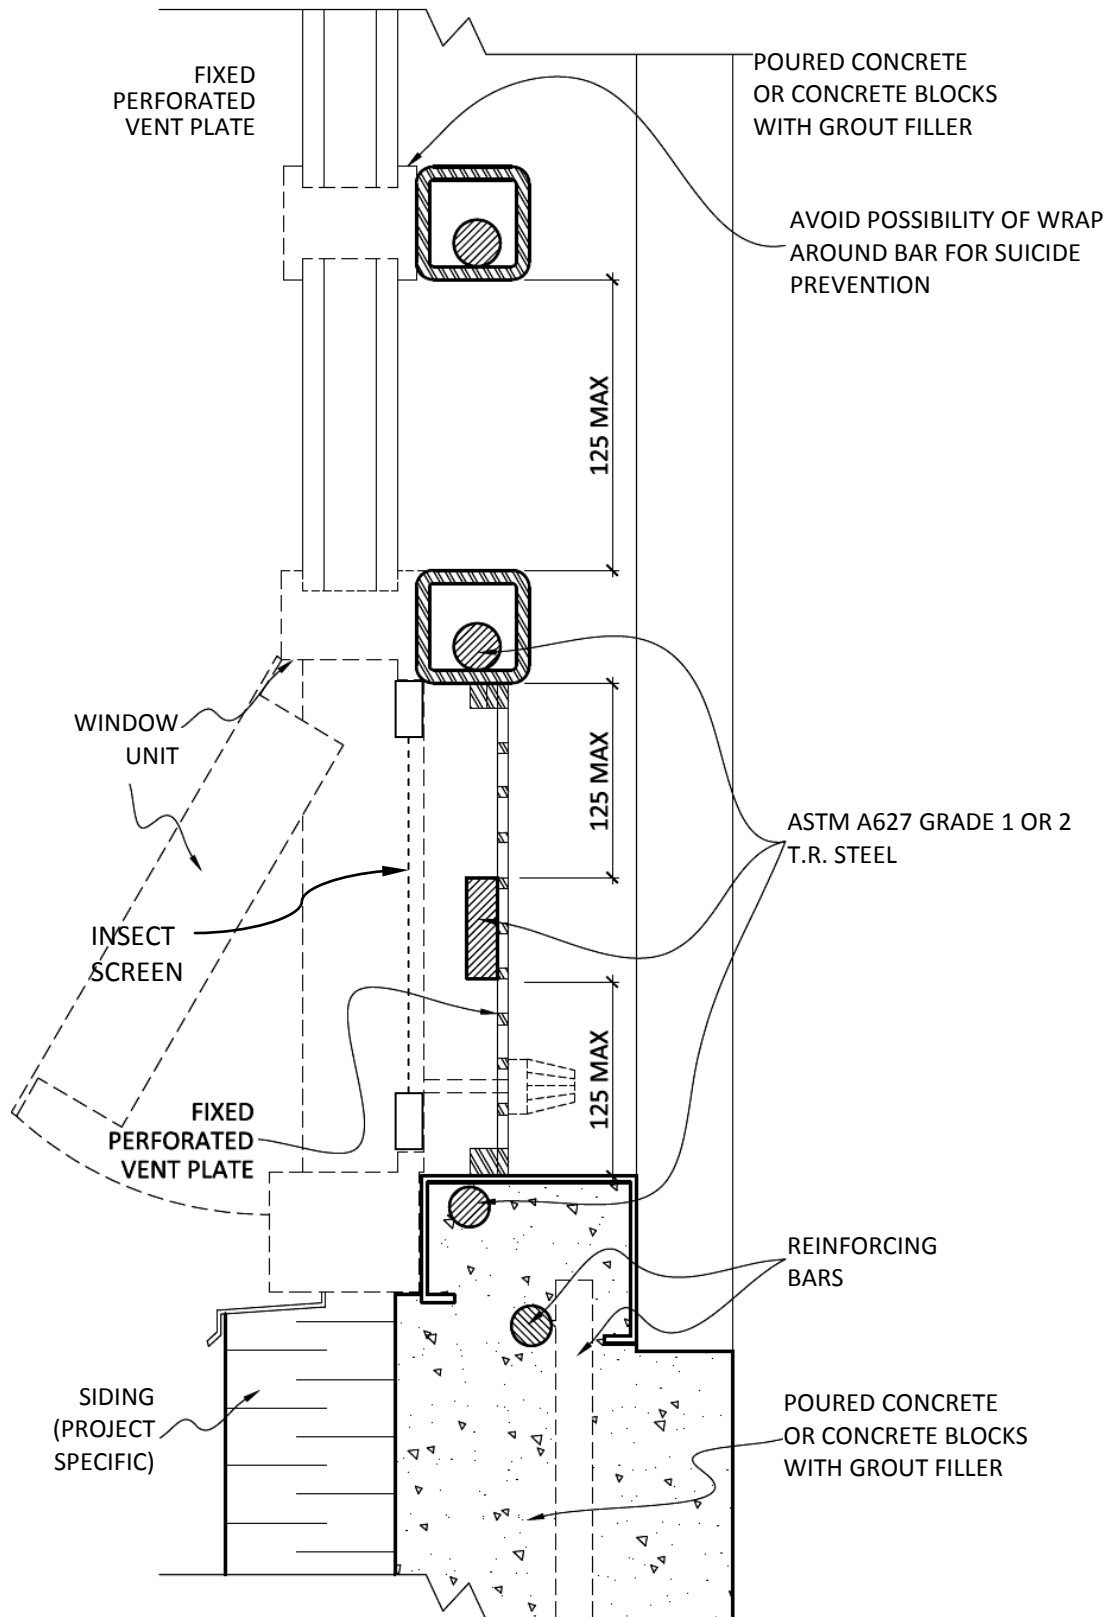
DW-2 WINDOW – HORIZONTAL BAR DESIGN – DETAIL
